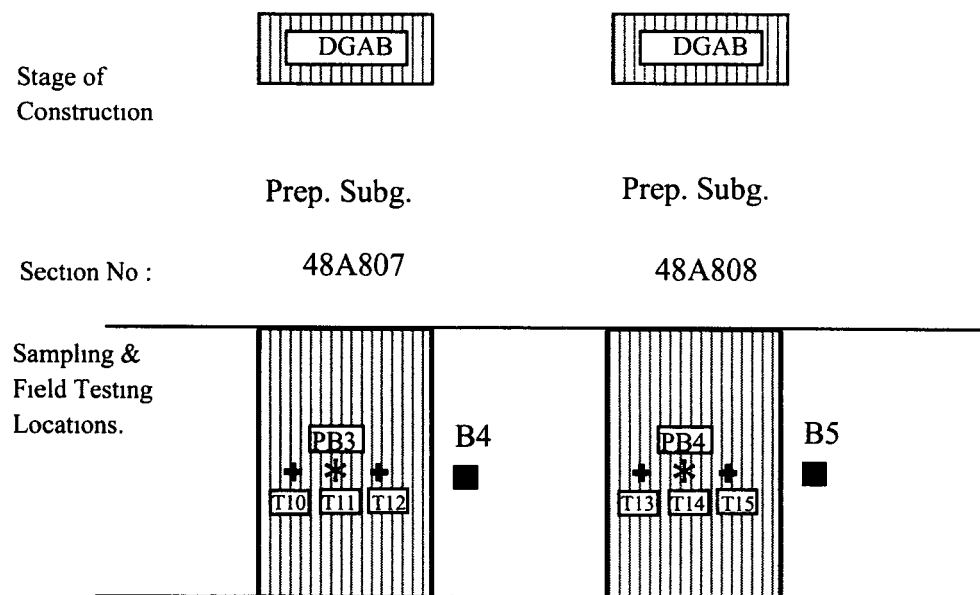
SITE LAYOUT WITH SAMPLING AREAS
